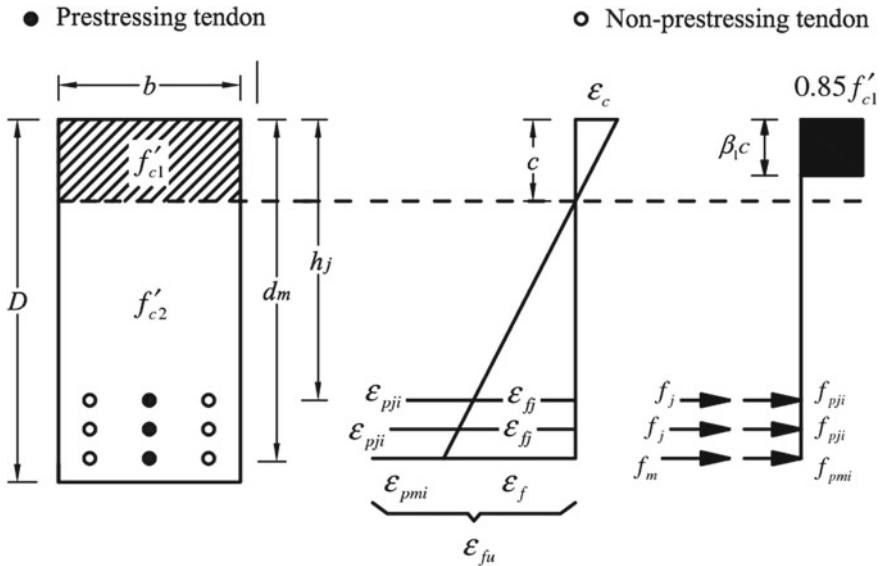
Cross-section, strain, and stress diagrams of the proposed BFRP-prestressed concrete beam
